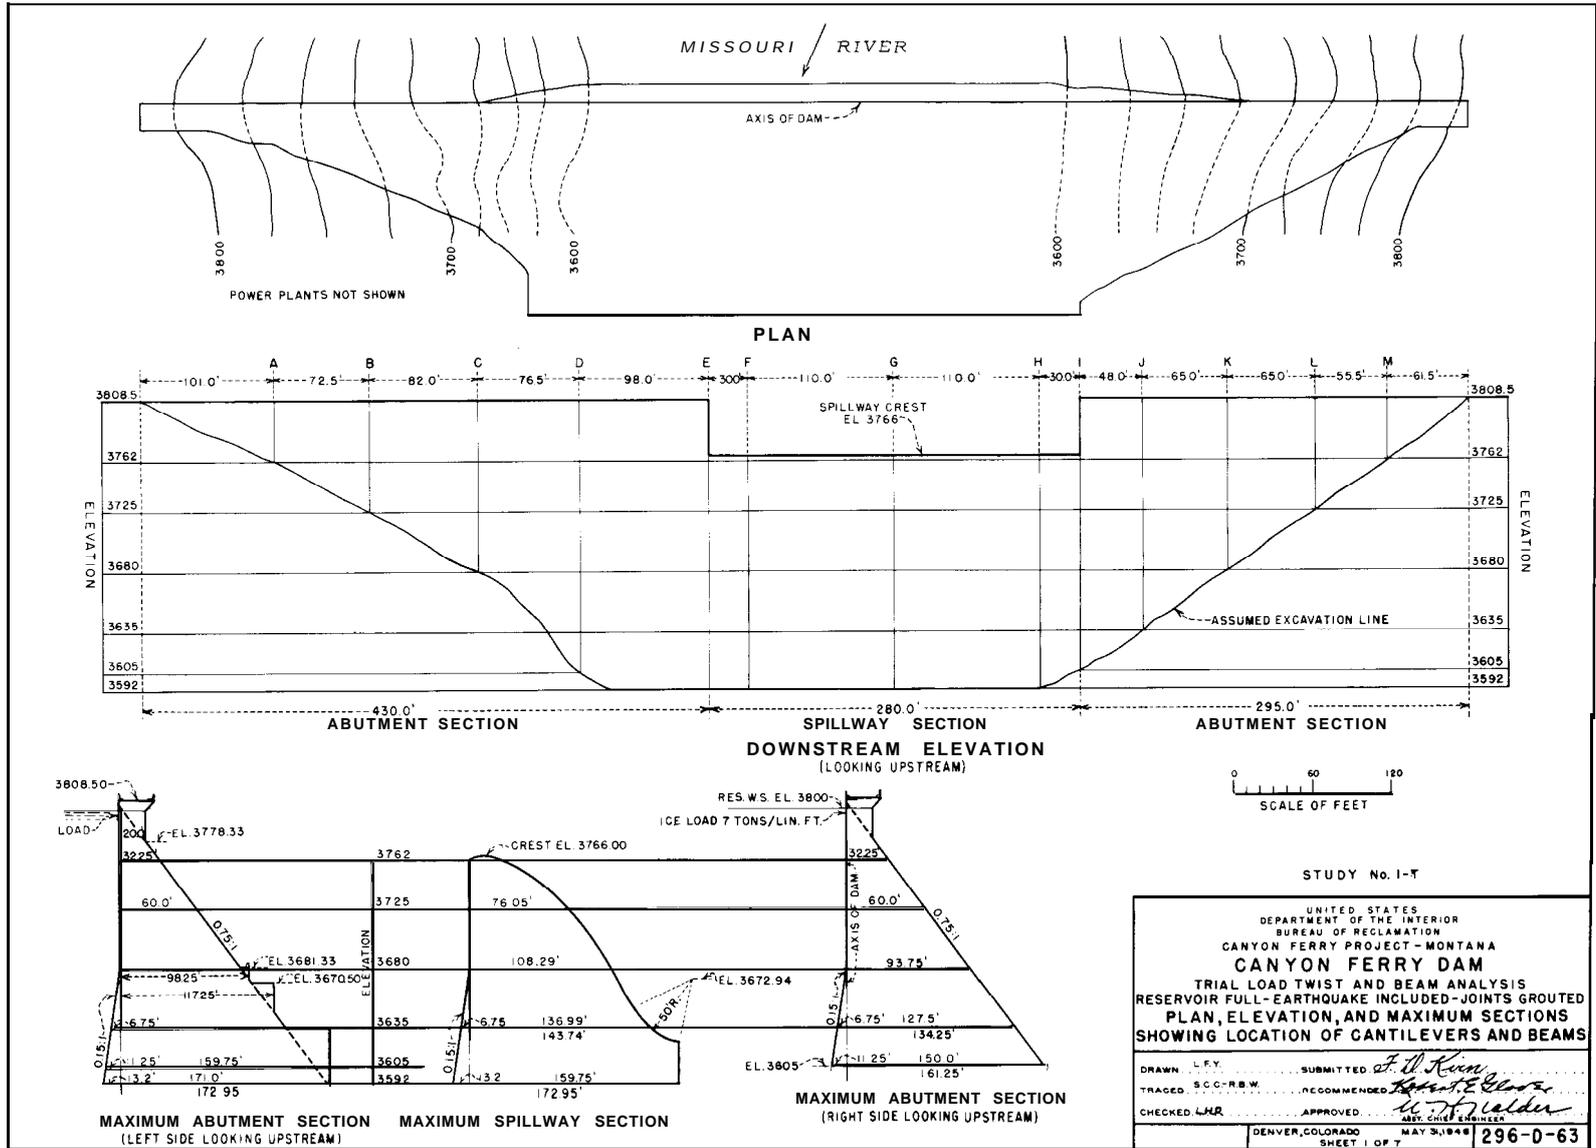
Canyon Ferry Dam study-plan, elevation, and maximum sections.
